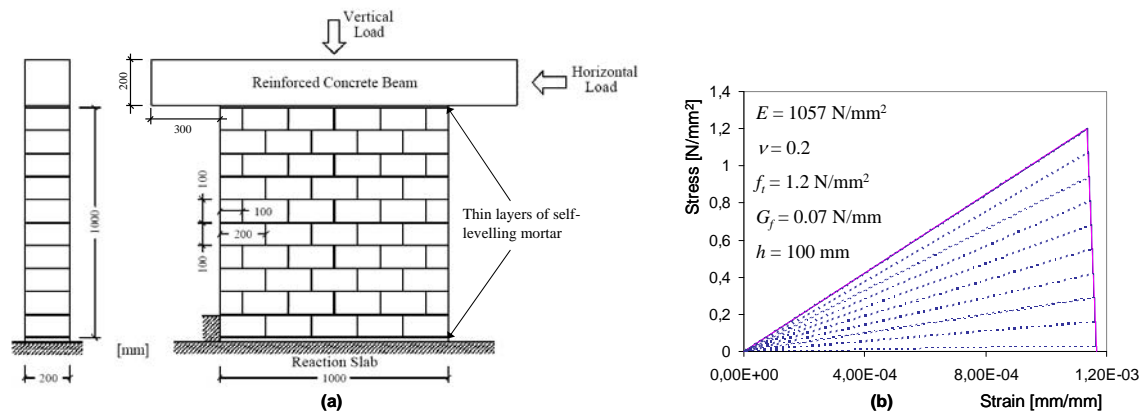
Geometry of the dry stone masonry wall and schematic loading arrangement by Oliveira [3] (a) and the adopted material behaviour – including saw-tooth diagram – of the masonry (b).
